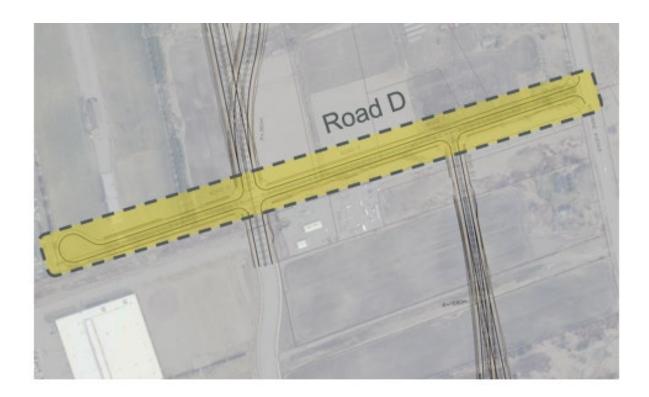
Preliminary Recommended Collector Road D Alignment
